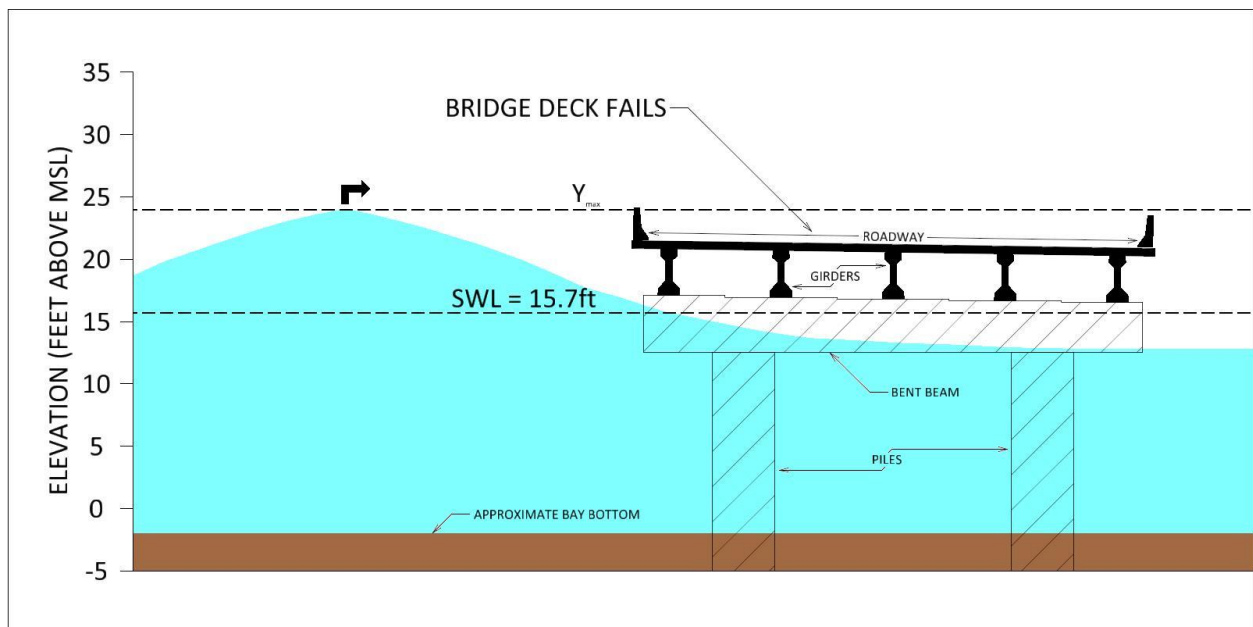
The findings of this study indicate that the bridge will be damaged by failure of the bridge deck, due to negative bending in response to the wave-induced uplift loads, when the storm surge reaches about +15.7 feet (even if the connections are strengthened).
